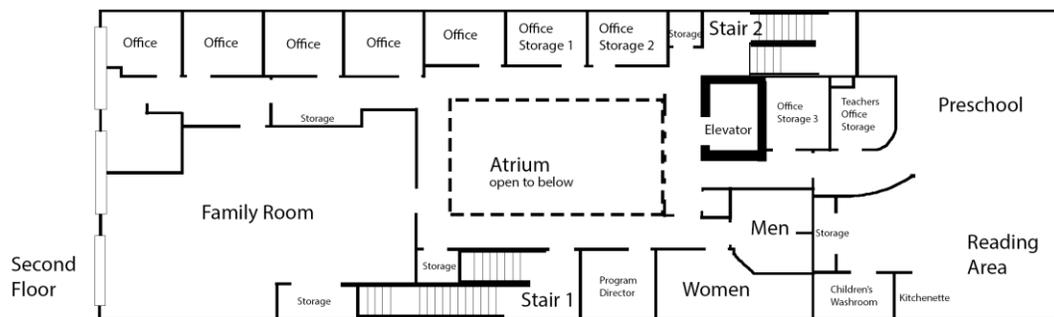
Floor plan of second floor, SVNH main building. Floor plan outline created by researcher from the architectural drawings provided by SVNH.
